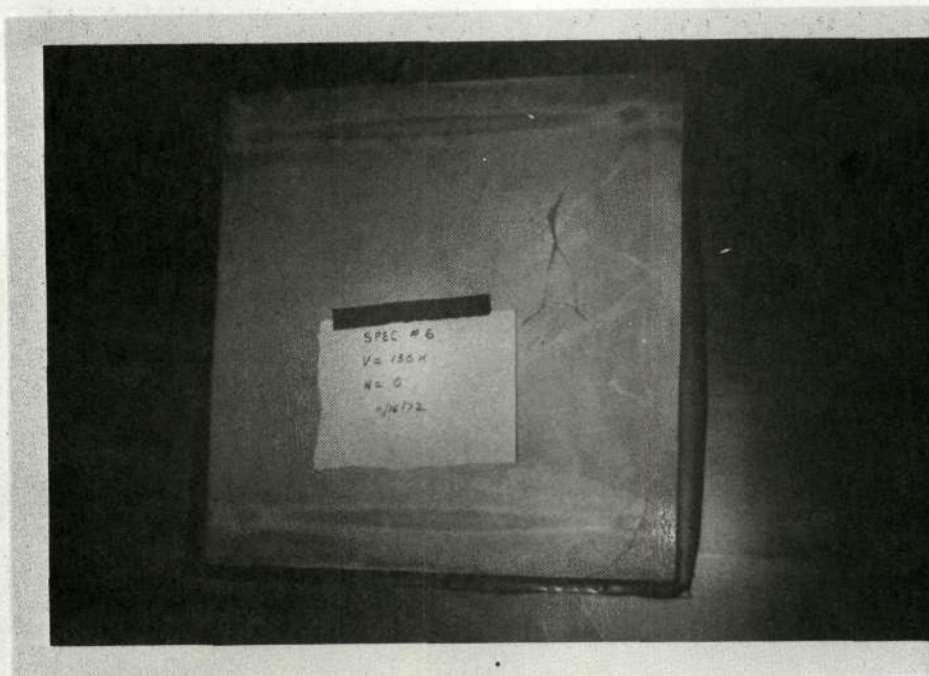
B PANEL 6 UNIAXIAL LOAD
